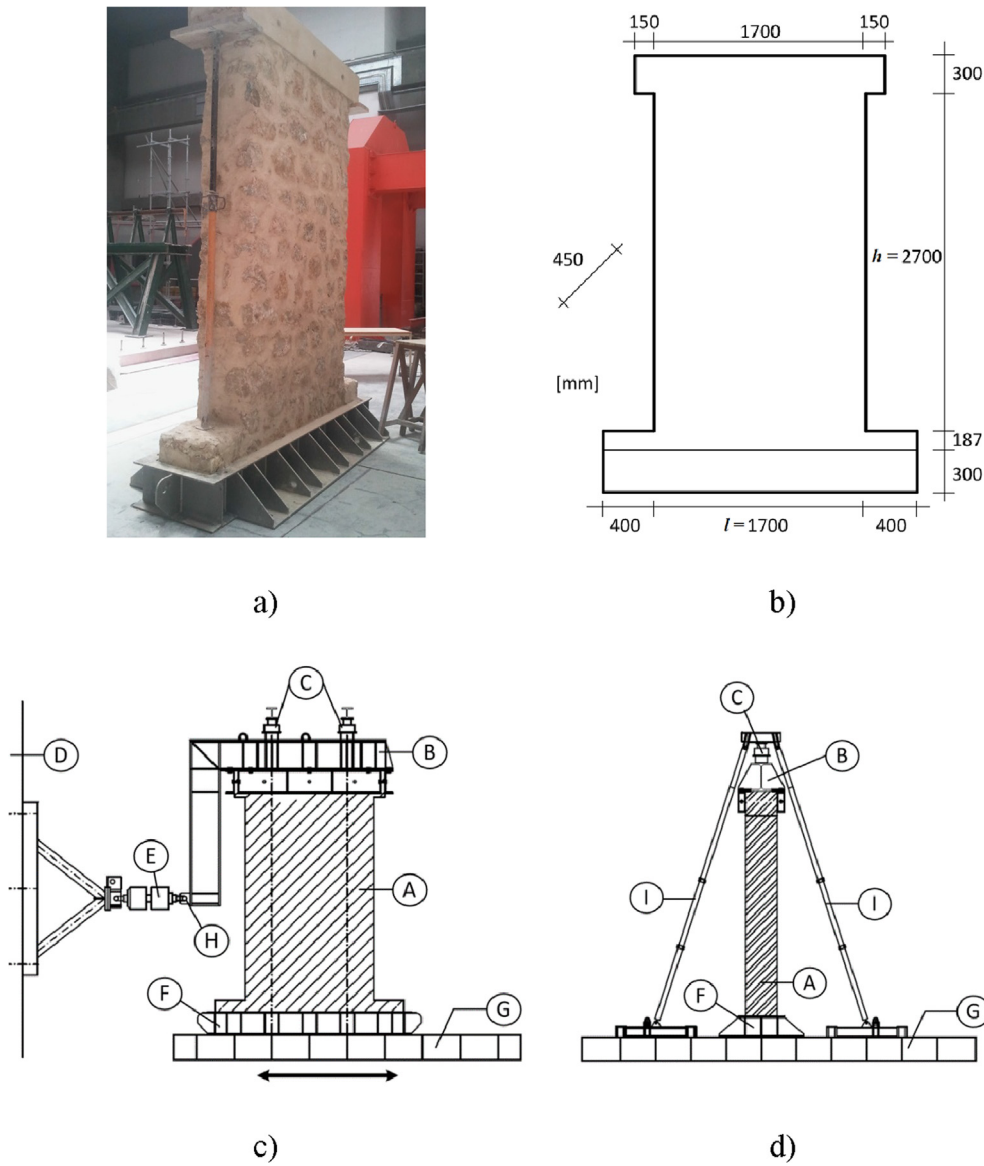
Experimental specimens: a) construction of the specimens; b) geometry of the specimens [dimensions in mm]; c) test setup at LNEC – front view; d) test setup at LNEC – lateral view. (A) specimen; (B) “L” shaped top support; (C) vertical actuators; (D) reaction wall; (E) horizontal load cell; (F) bottom support; (G) shaking table; (H) fixed horizontal translation; (I) steel anchors for applying the vertical load.
